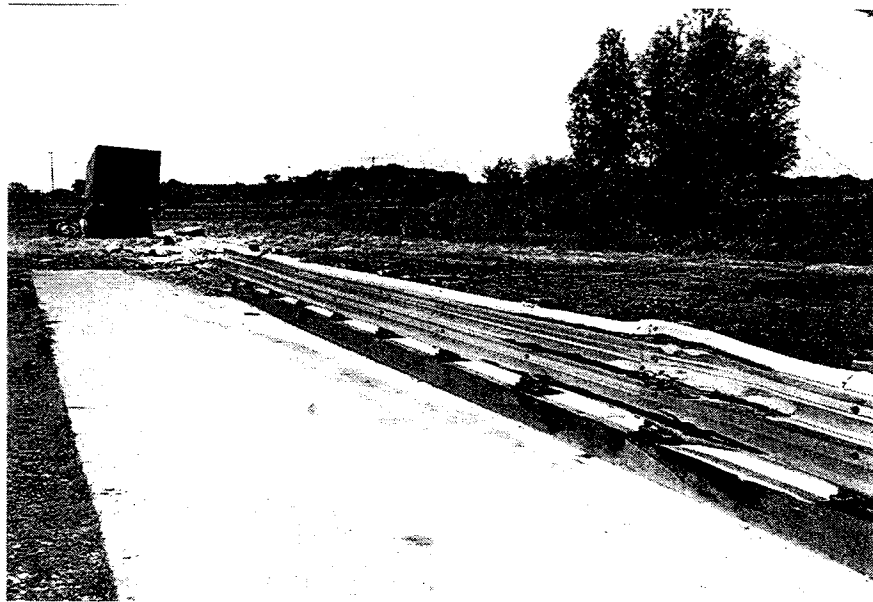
Delaware retrofit bridge railing after test 472070-7.
